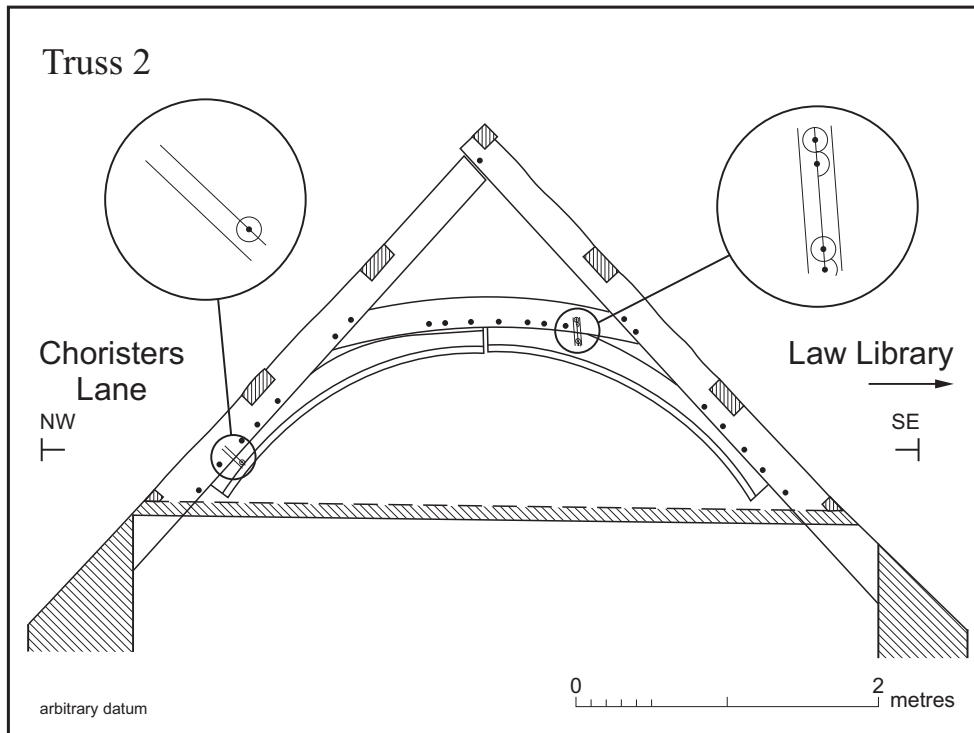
Roof 1: measured elevation of Truss 2 from the NE.
